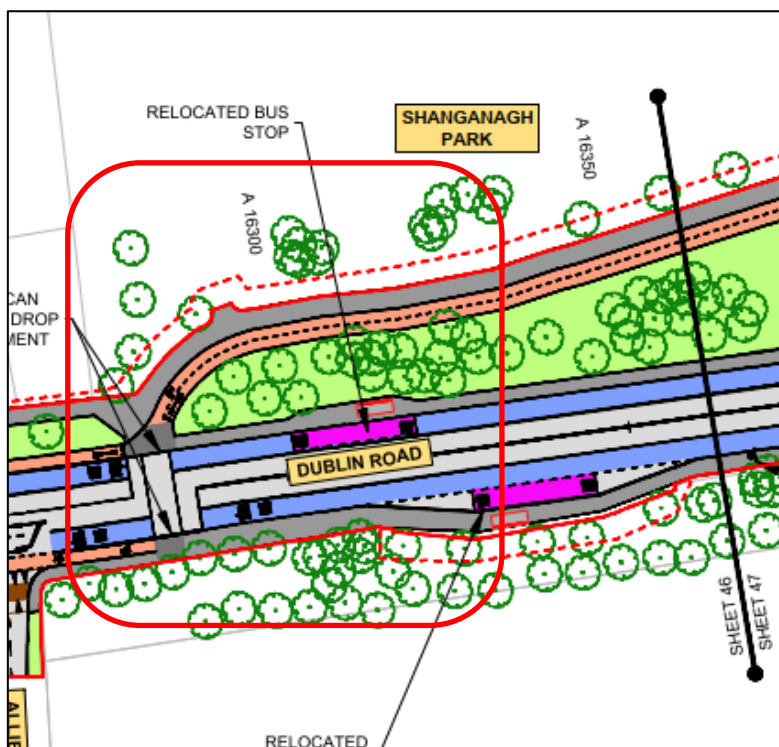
Extract from General Arrangement Drawings showing Proposed Toucan Crossing at Chainage 16+280 (Sheet 47)
